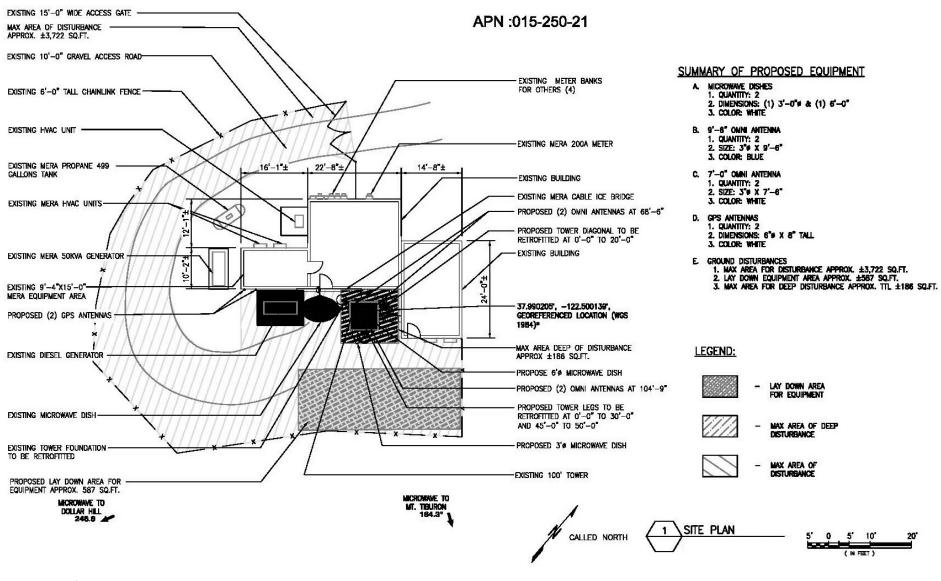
Site 11 - San Pedro Ridge Site Plan
